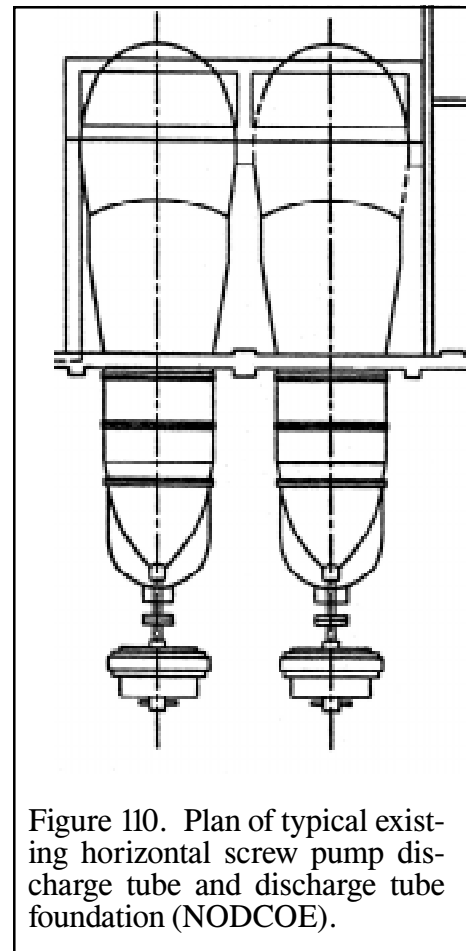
Plan of typical existing horizontal screw pump discharge tube and discharge tube foundation (NODCOE).
